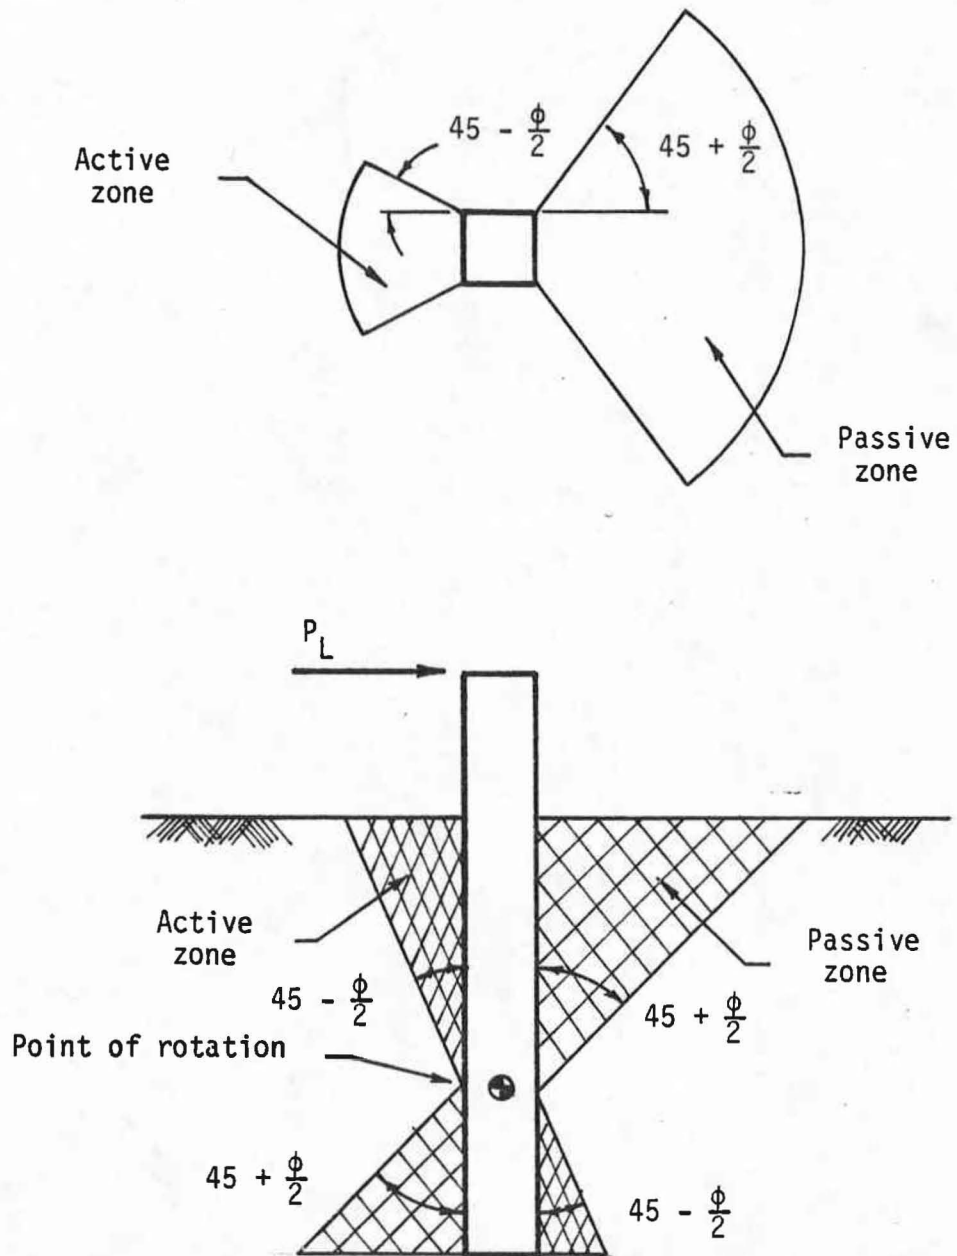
Failure Zone for Laterally Loaded Rectangular Shaft
